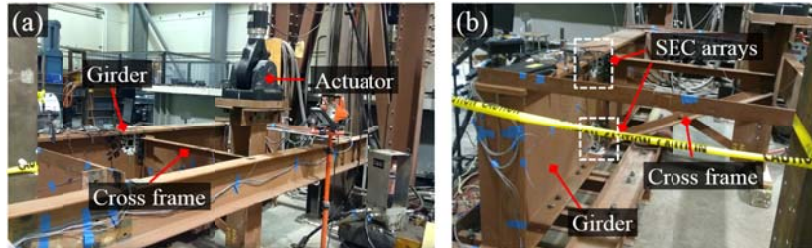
The tested model is a bridge girder to cross frame connection in which the cross frame is perpendicular to the girder.
